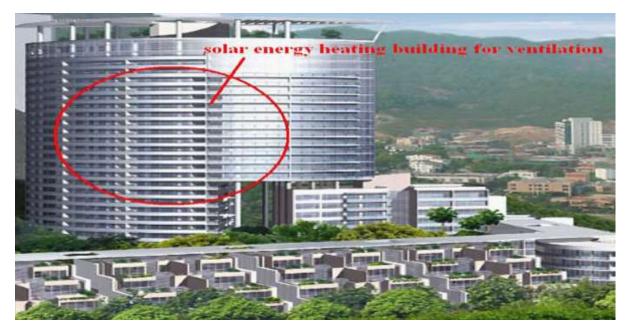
Solar heating of building with trombe wall for natural ventilation(Li et al,2007).
